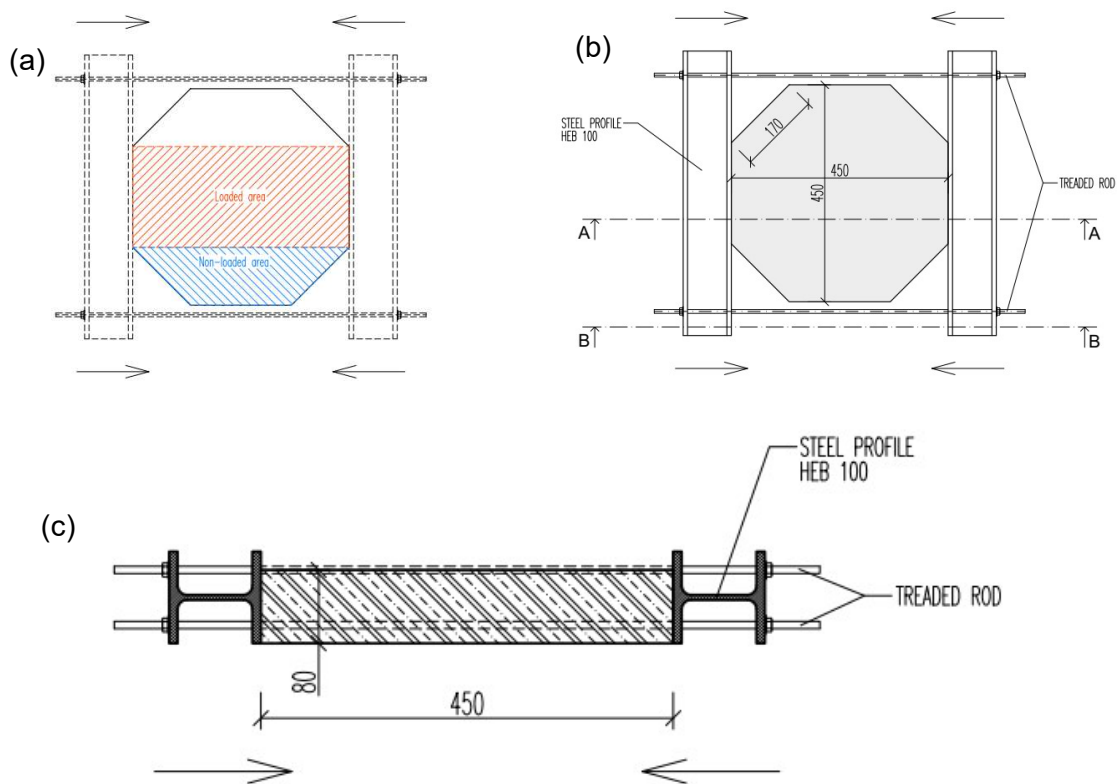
Schematic drawing of the test slab: (a) The uni-axial loading is applied in central area due to the shape of tested slabs; (b) Dimensions of the test slab; (c) Placement of steel profile HEB 100 and prestressing treaded rods.
